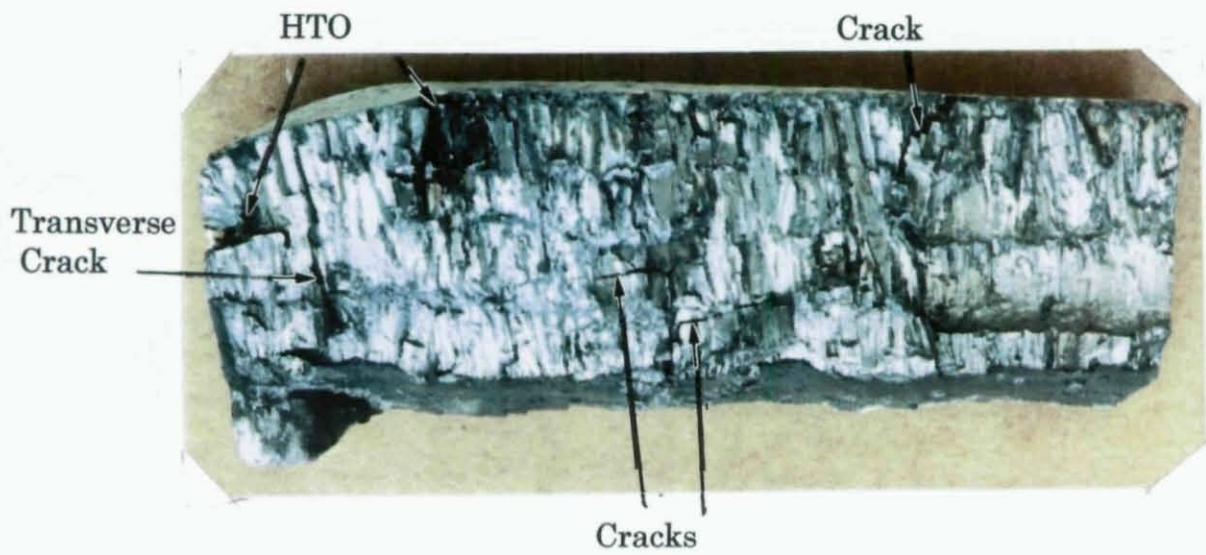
Fracture surface of the south end from the west-beam bottom-flange joint
